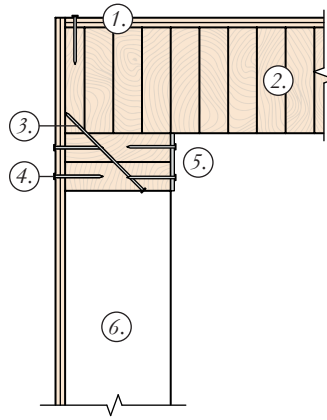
NLT Connection to Interior Wood Shear Walls
